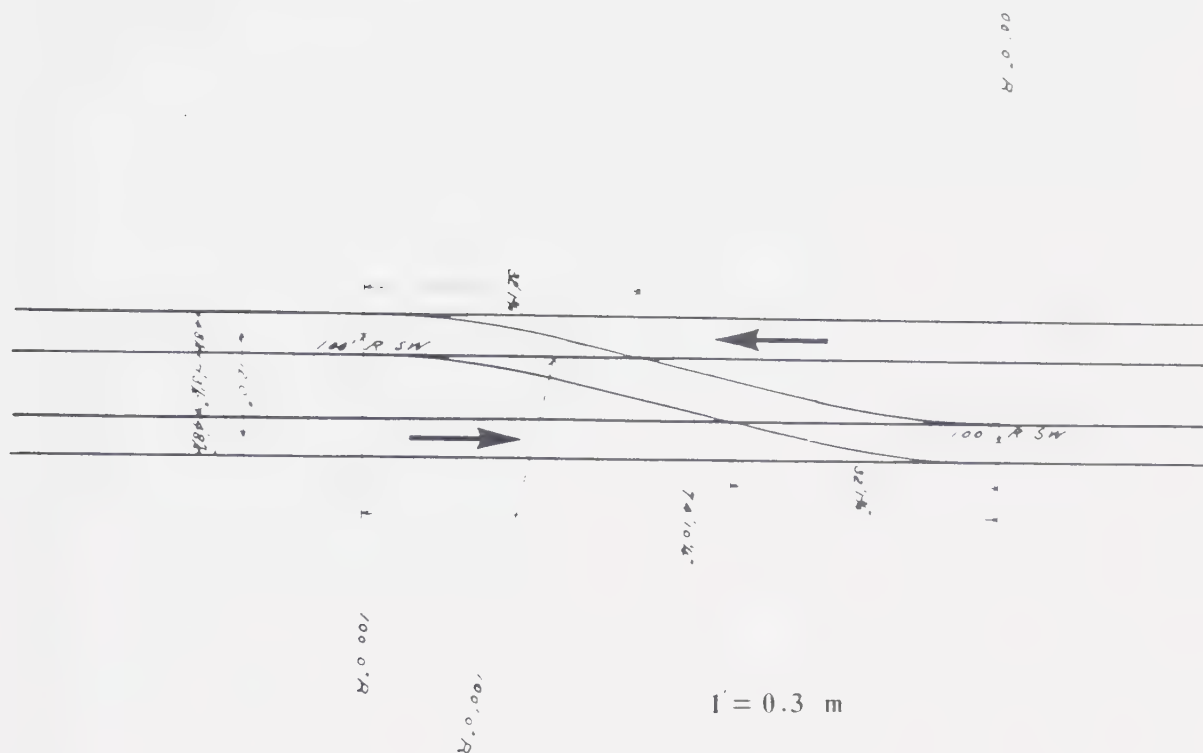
PLAN OF RIGHT HAND CROSSOVER
